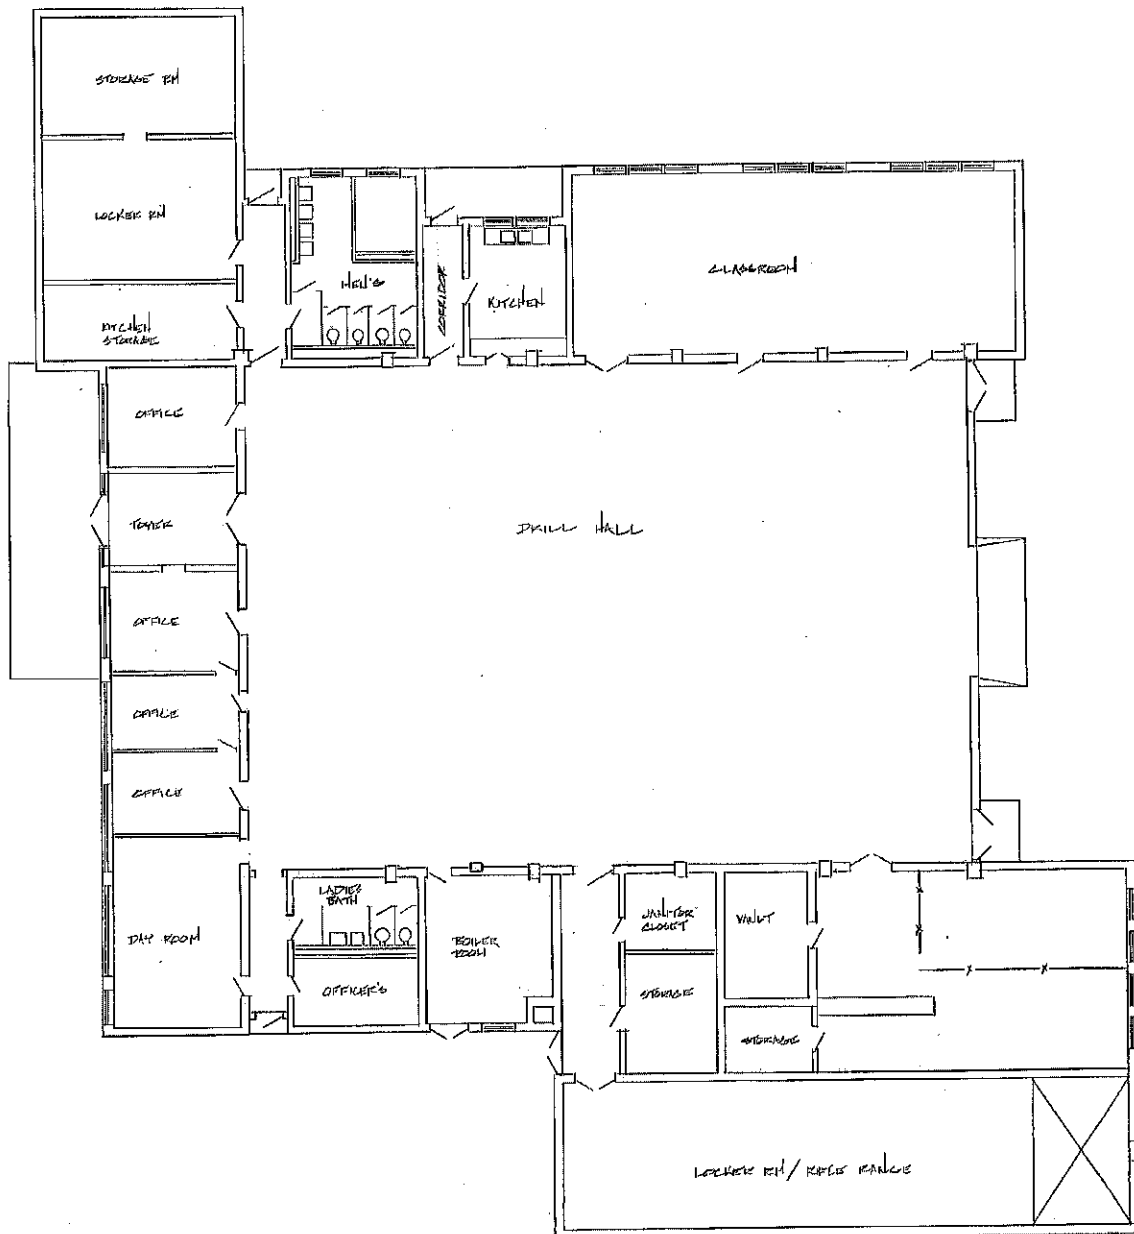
Floor Plan of A-Alt Armory, Mount Airy, North Carolina
